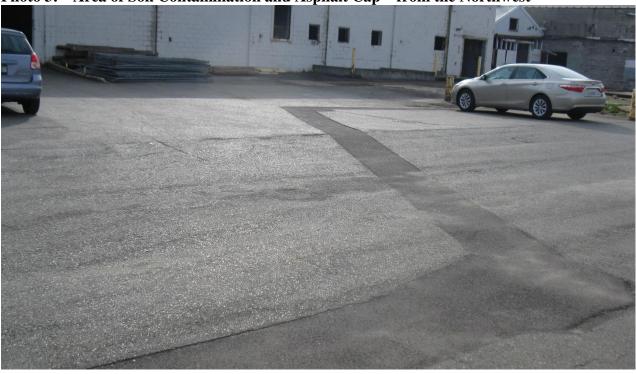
Area of Soil Contamination and Asphalt Cap – from the Northwest
